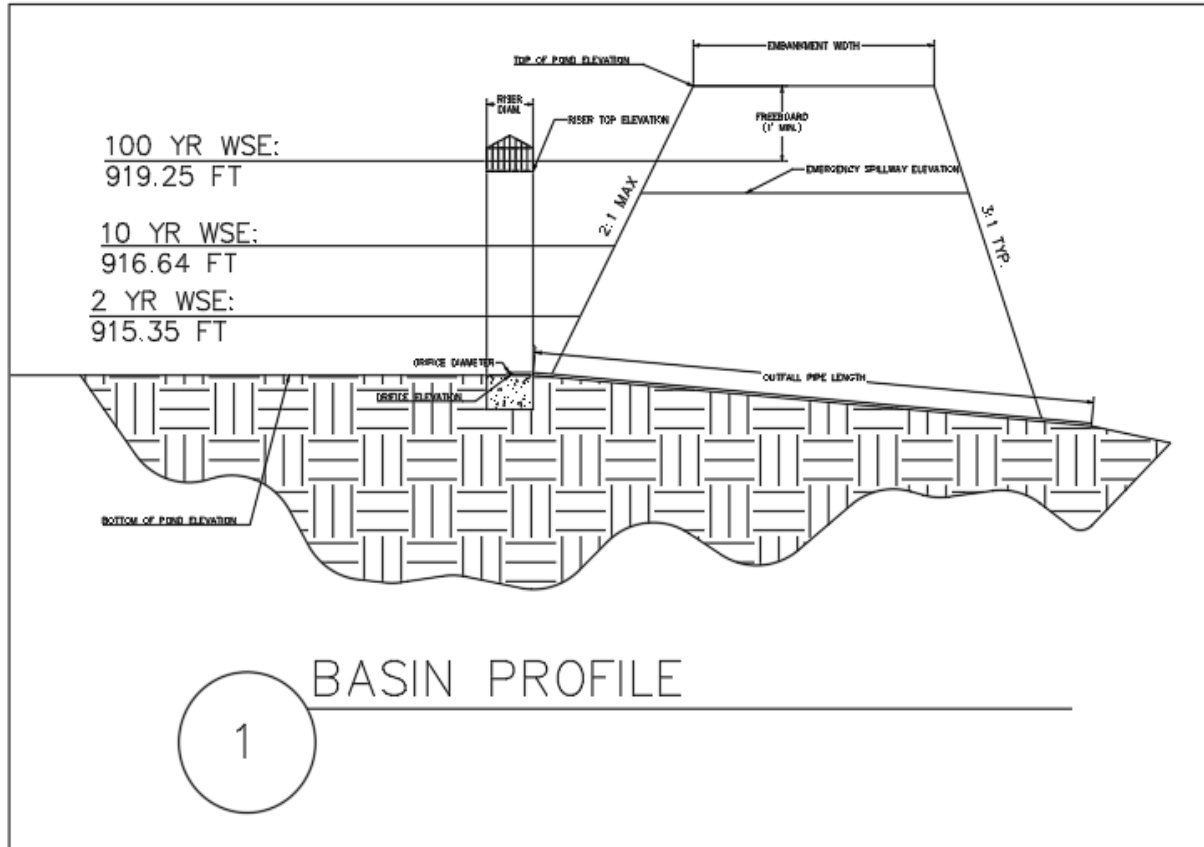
Outlet structure and basin profile with 2-, 10-, and 100-year water surface elevations
